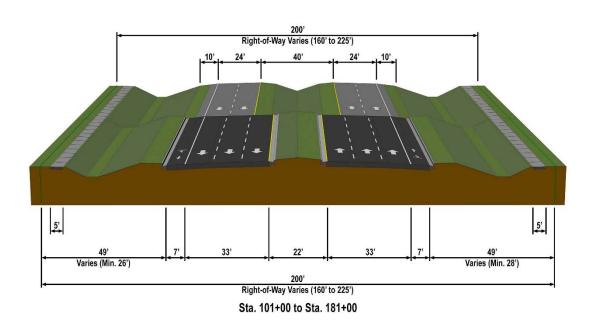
Urban Typical Section – Alternatives 1 & 2
